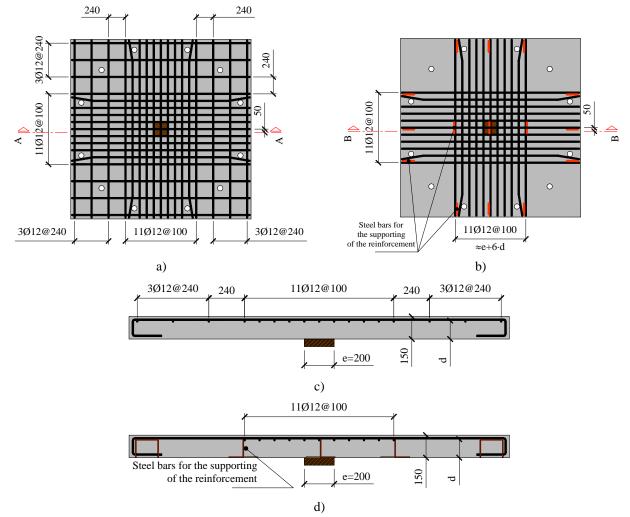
Flexural reinforcement in: a) reference slabs; b) SFRSCC slabs; Cross section of c) AA, and d) BB (dimensions in mm).
